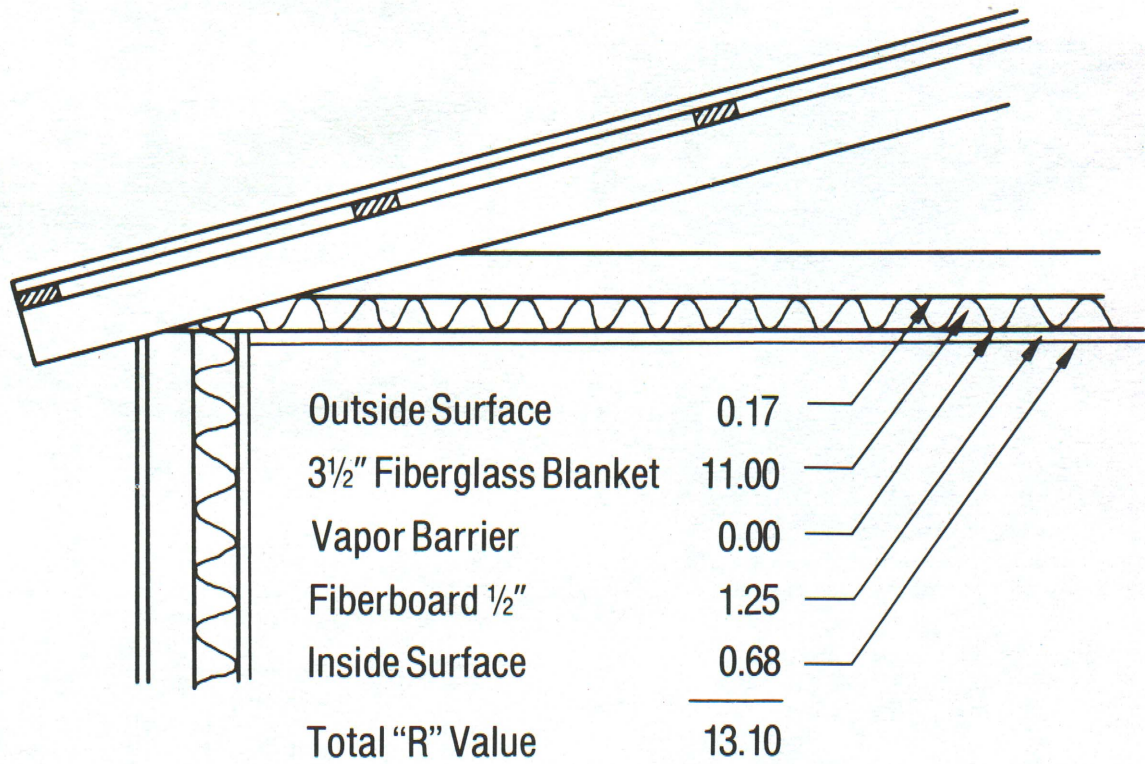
Insulated wood frame ceiling. Reducing the insulation to 1½ in. of fiberglass blanket reduces the ceiling R to 7.35. Changing ½ in. fiberboard (1.25 R) to ½ in. plywood (.62 R) and using only 6 in. of rockwool insulation (19.80 R) increases the ceiling R to 21.27.
